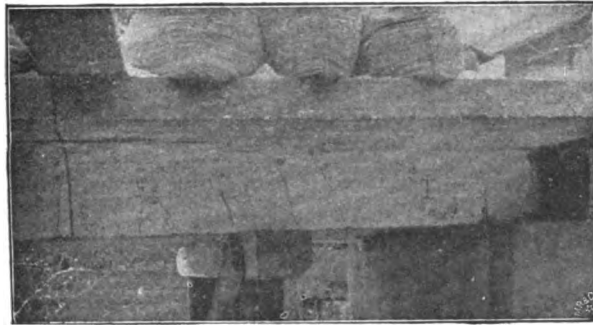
Beam I, cracks in the end supplied with stirrups, at the breaking load.
